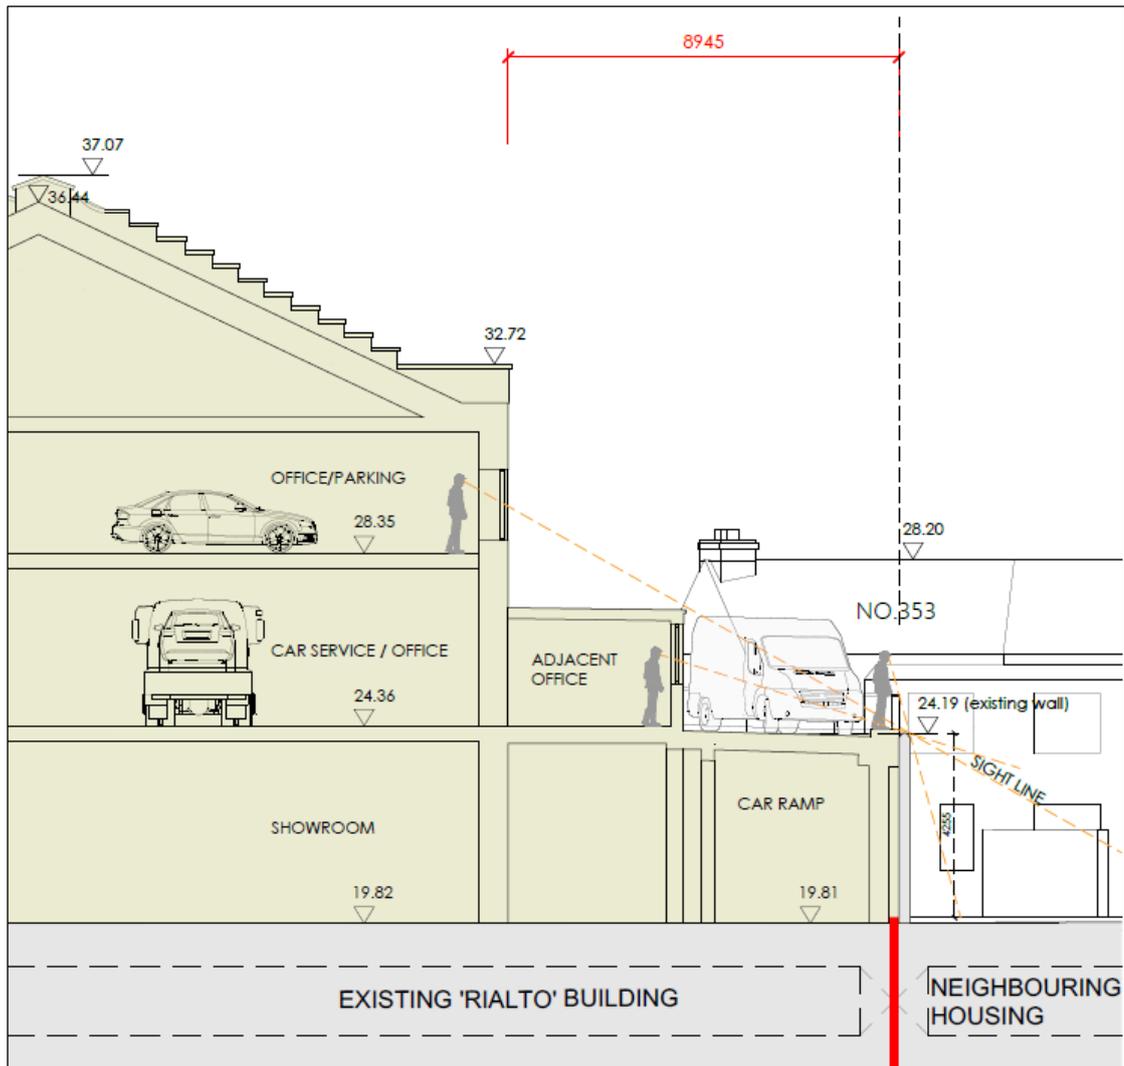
Extract of Drawing No. SB-2017-015-303 Rev. E, prepared by ShipseyBarry, which shows how the existing building does not protect adjoining housing units from overlooking onto the rear garden.
